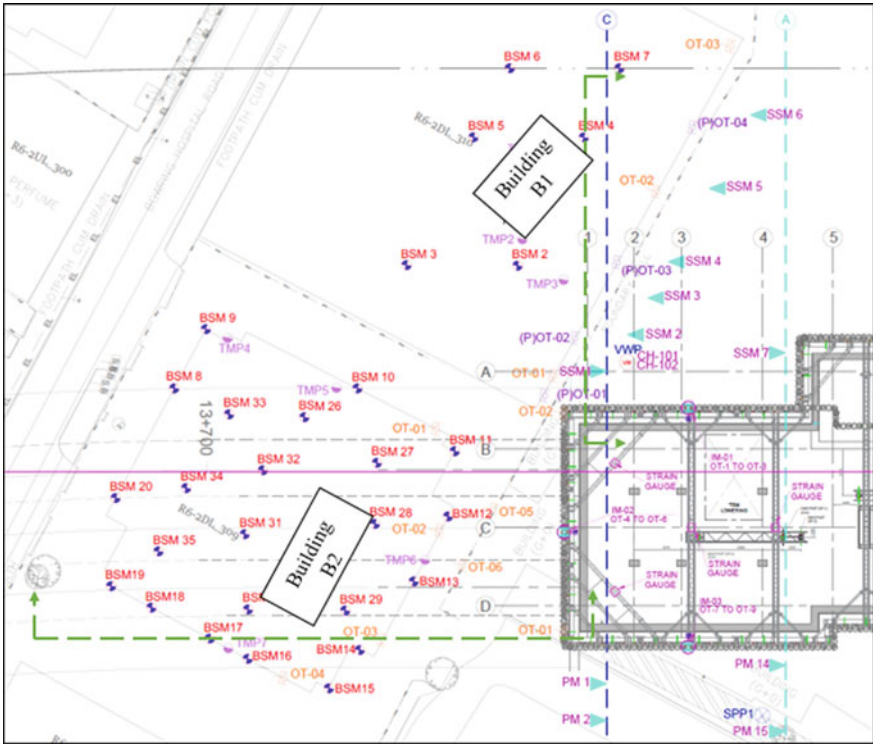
Foundation layout for the buildings B1 & B2 Plan indicating cross-section considered for analysis
